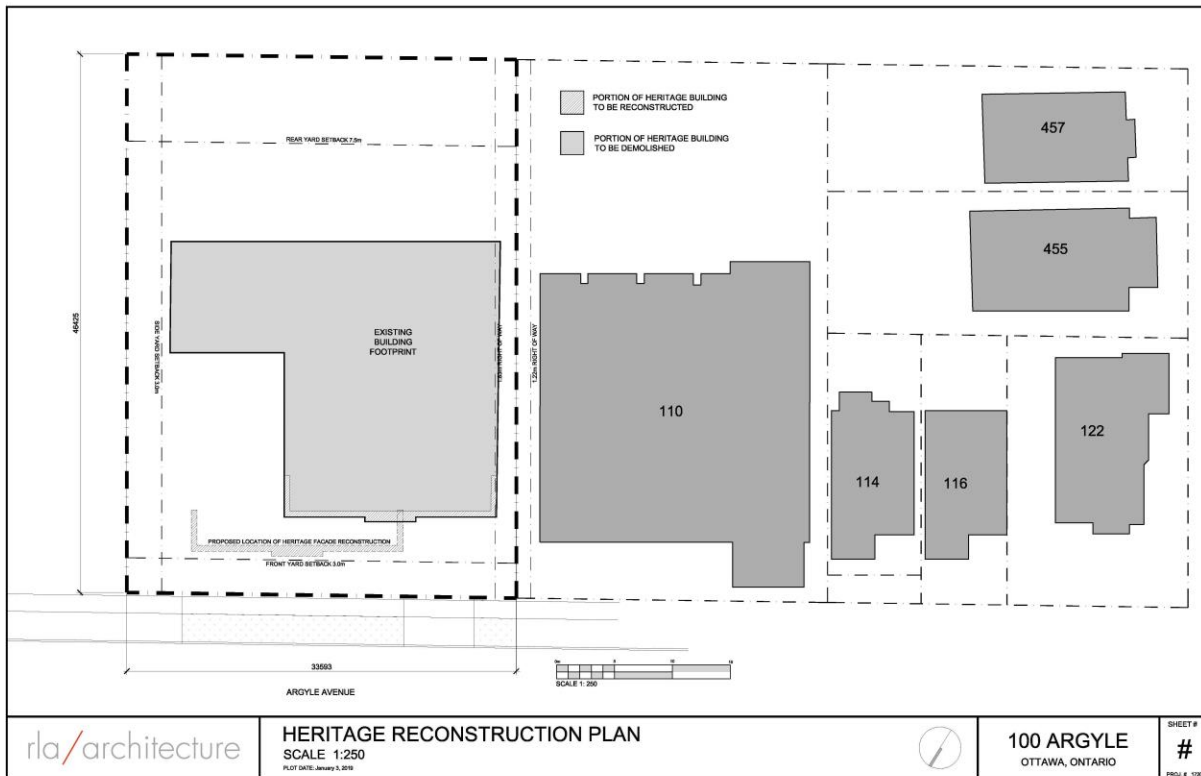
Plan view indicating the extent of building being retained and its siting as part of the new development. Source: RLA/Architecture
